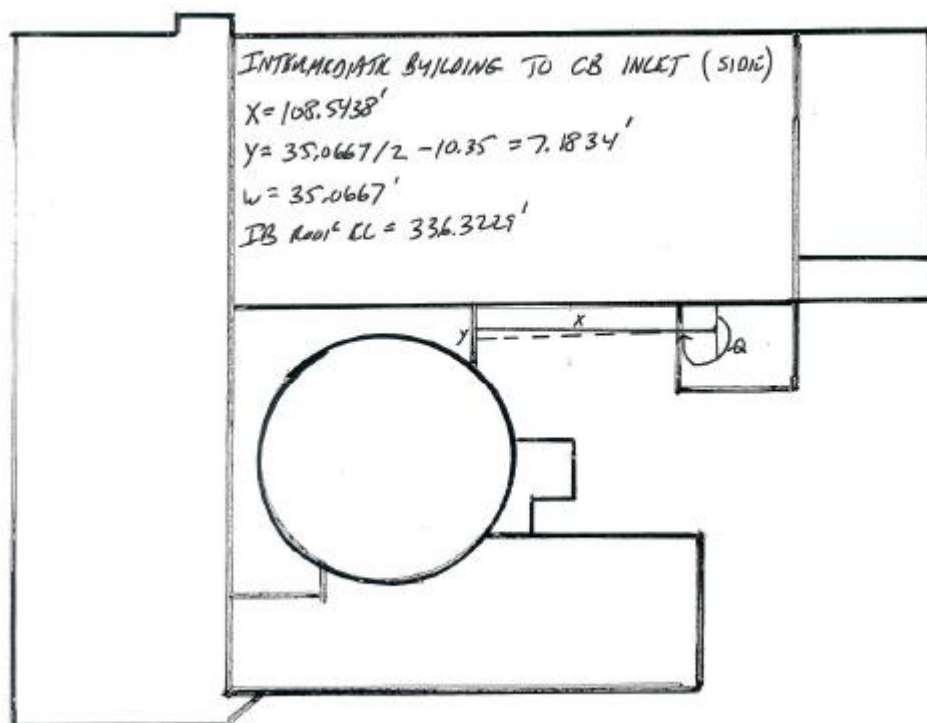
Intermediate Building Roof and Walls (Area Source) to Control Room Inlet
